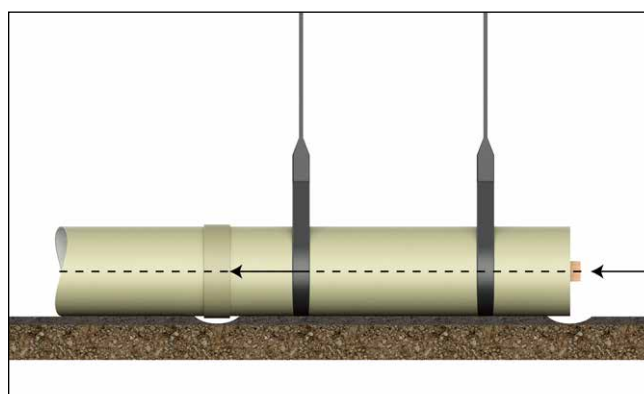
Pipe joining with suitable equipment (slings not necessarily required)
